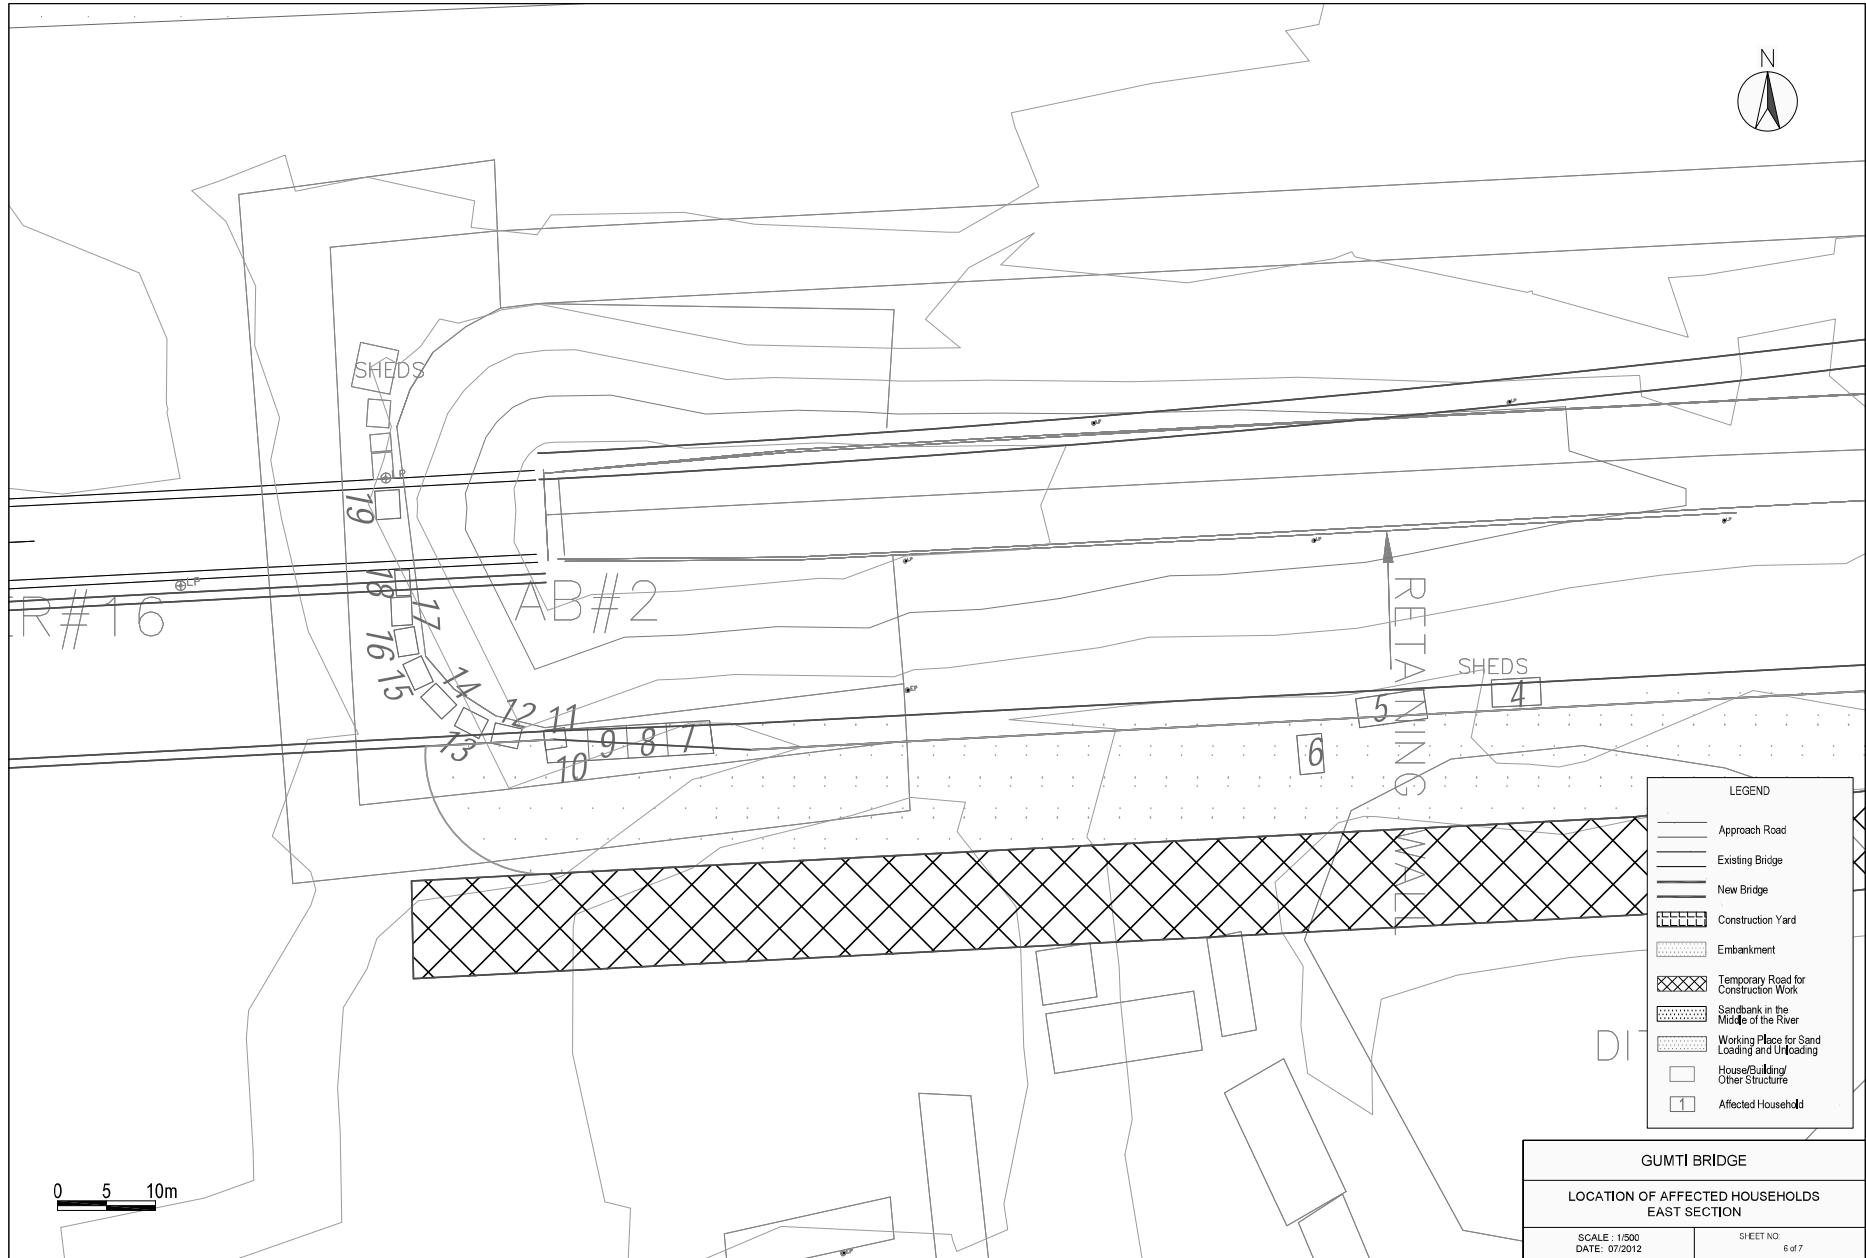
Location of Affected Households East Section (Sheet No.6)
